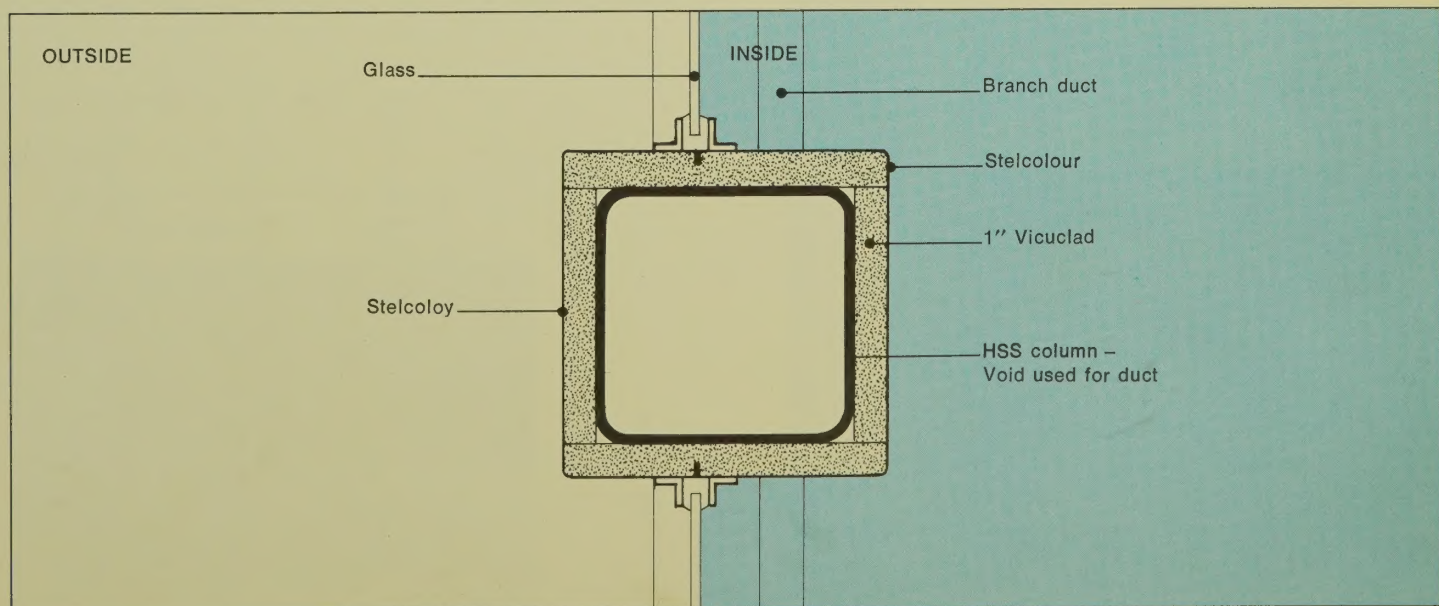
HSS columns at 10-foot centres and utilizing the void in the column as the duct supply.
